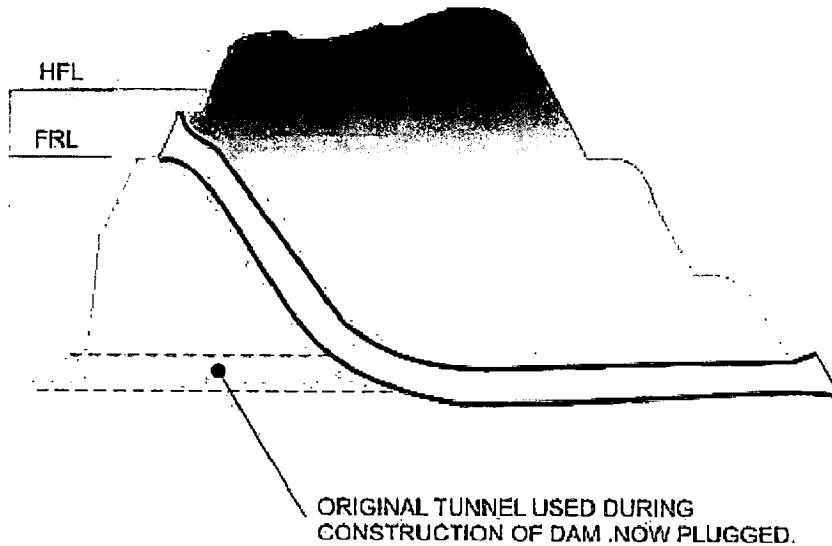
Bell Mouth entry of a Tunnel Spillway
